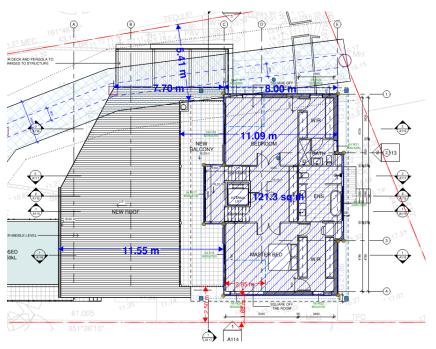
proposed floorplate of the upper building level; the floor plate is approx. 8m deep and $121 m^2$ in area
